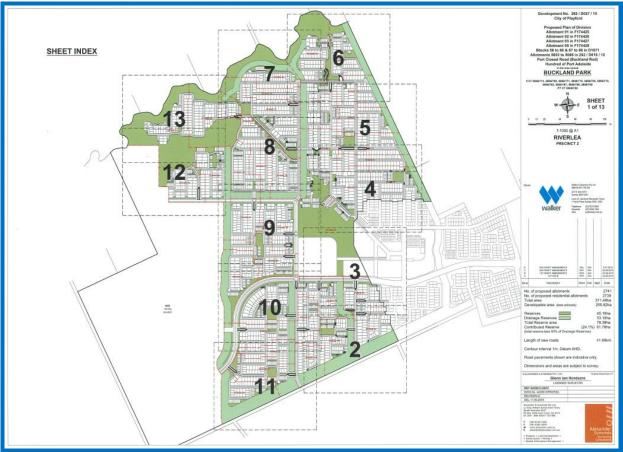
Approved Precinct 2 Land Division Layout Plan
